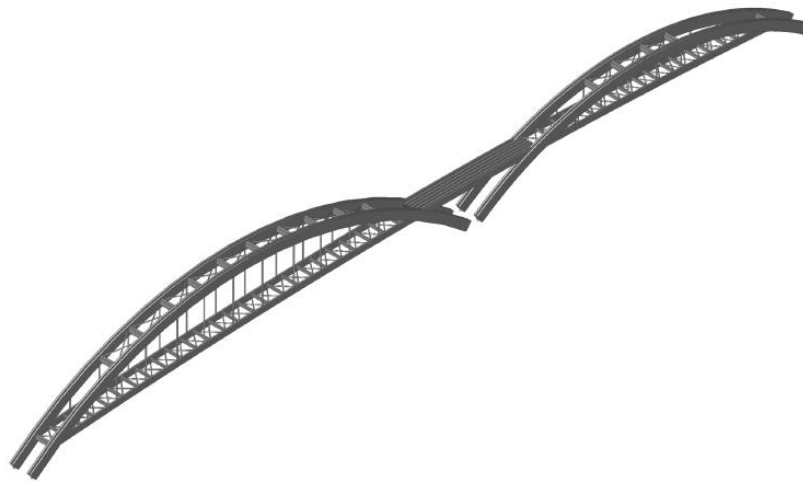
Pre-design Proposal 1 - 3D Structural Isometric View - SCIA Engineering
